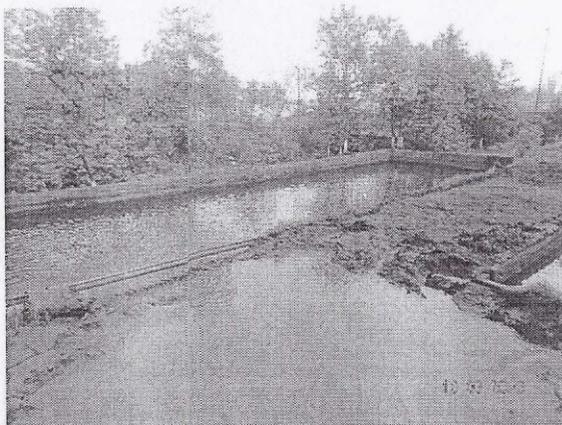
Photo of large concrete tank in the project adjacent to river Sonadubi.
